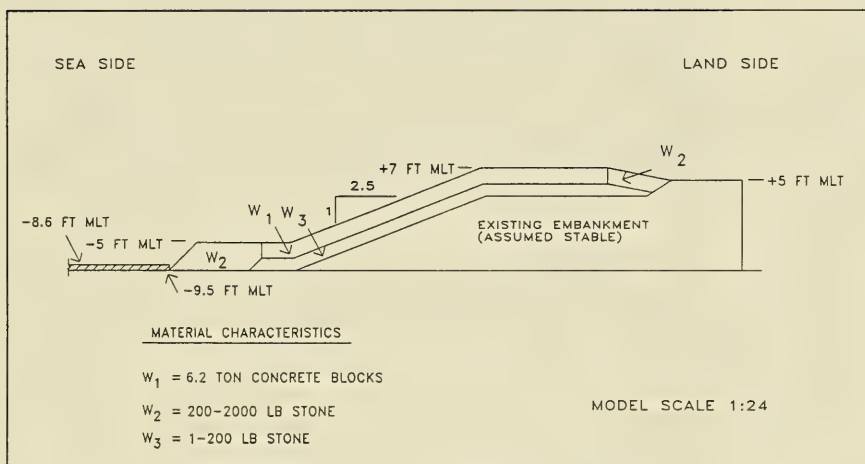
Concrete block revetment cross section, Plans 4 and 4R
